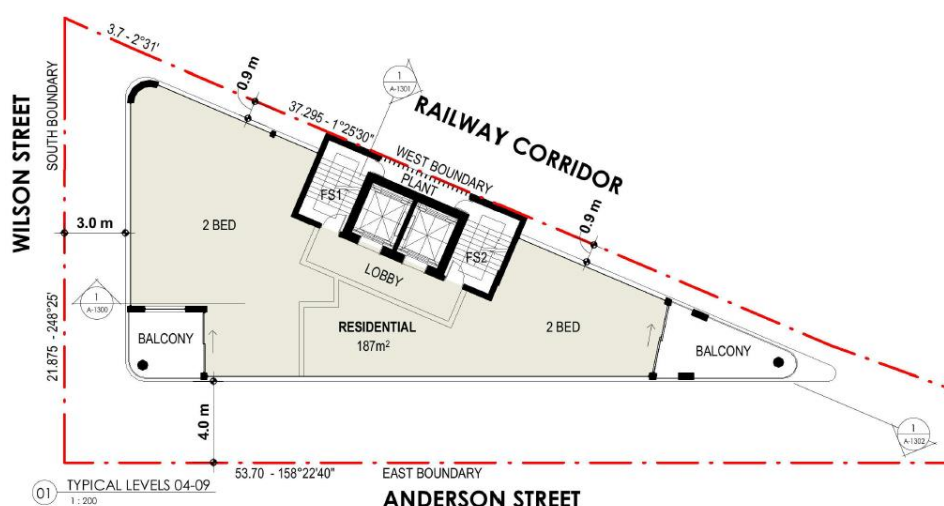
Residential tower levels four to nine floor plan with two-bedroom apartments (source: Drew Dickson Architects)
